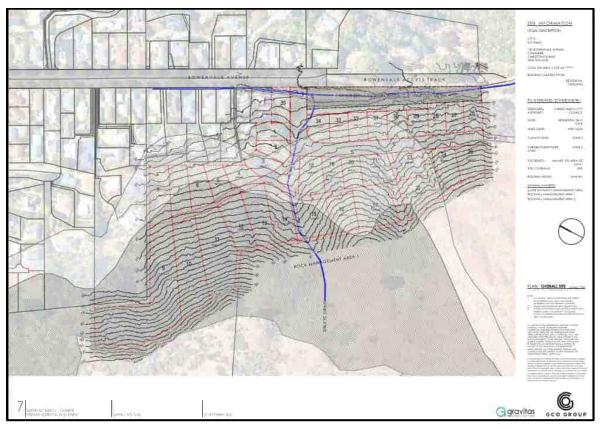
Site Development Plan, stream crossing location is located adjacent to Lot 35 and Lot 34.
